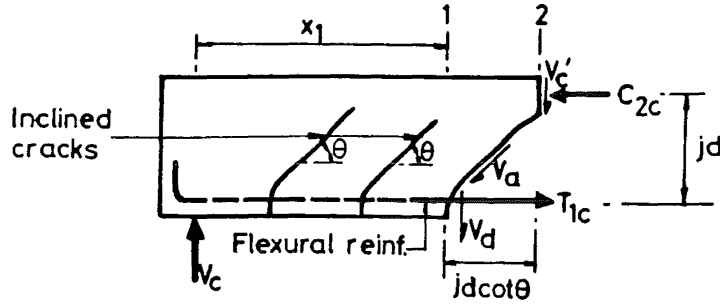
Forces on the free body of a reinforced concrete beam element with no web reinforcement
